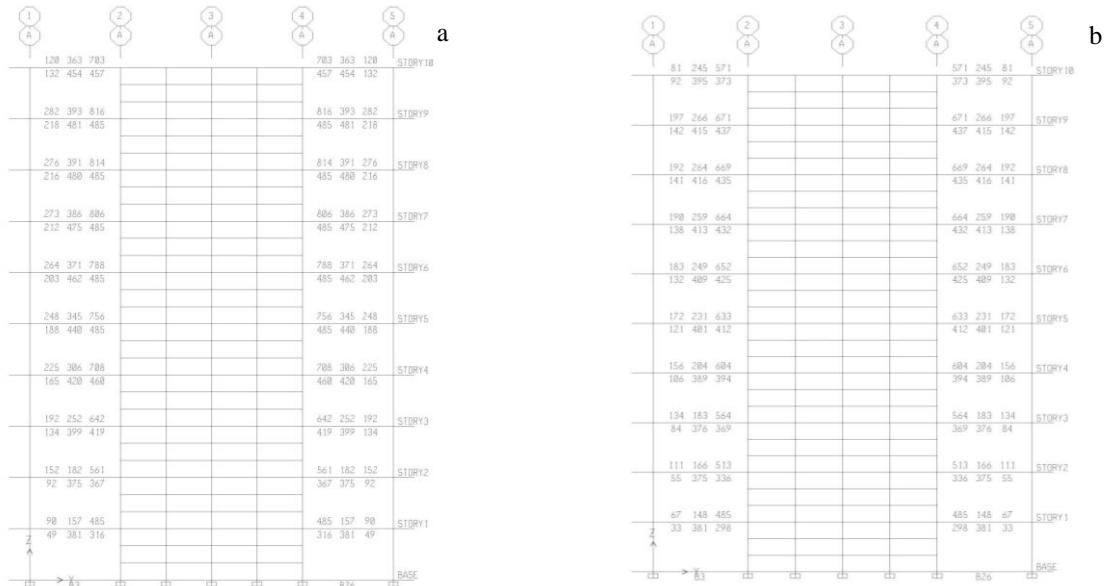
(a) Cross-section of beams from 10-V3 in mm, (b) Cross-section of beams from 10-V4 in mm
